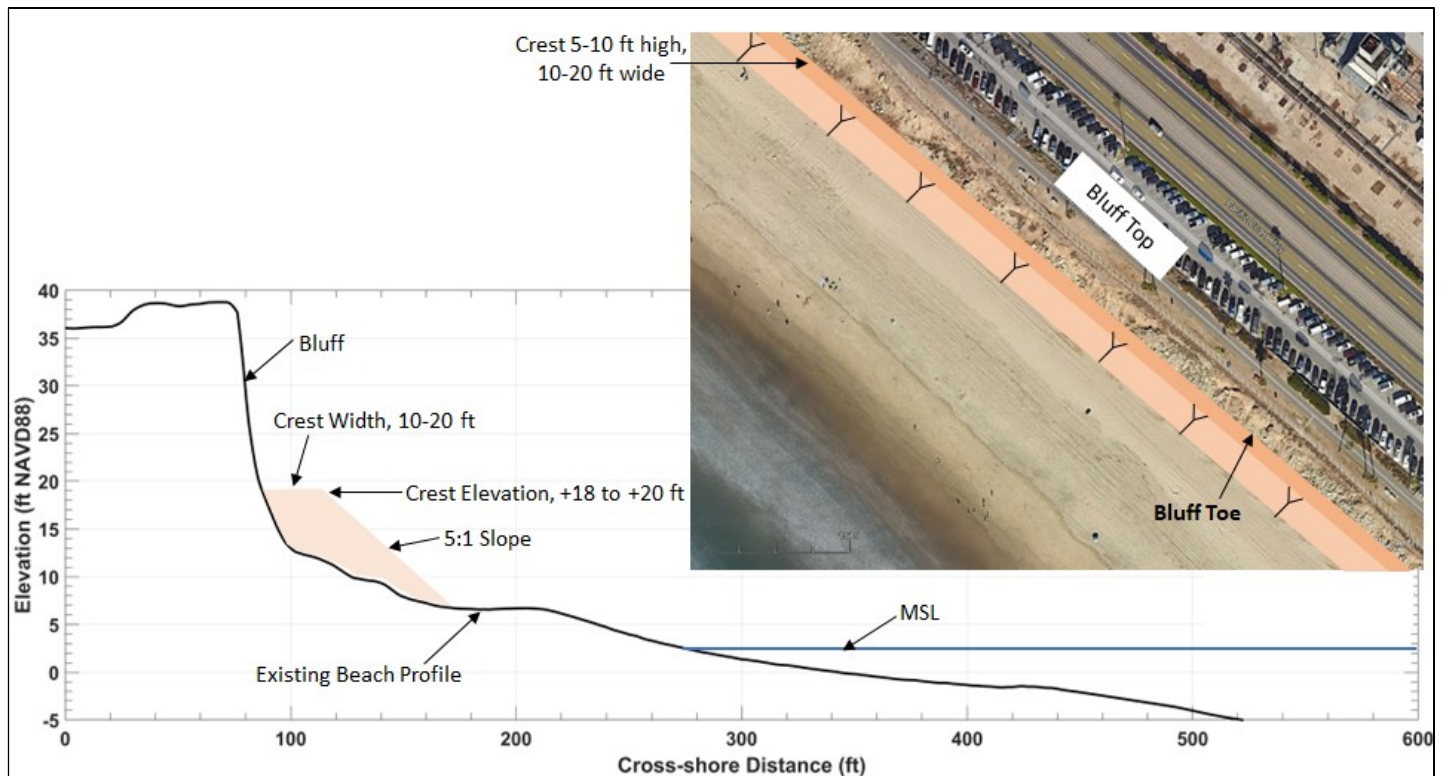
Backbeach Bluff/Cliff Stabilization Design Plan View and Cross Section
